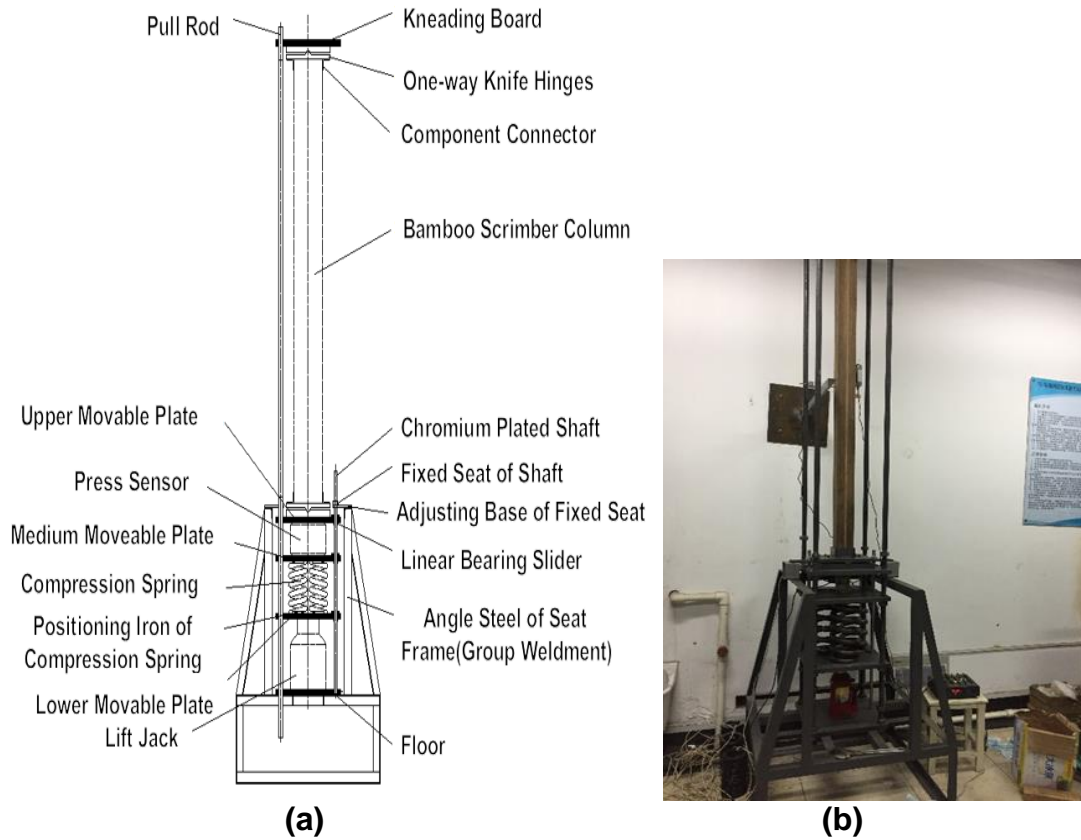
Test setup: (a) Device design drawing; and (b) test device
